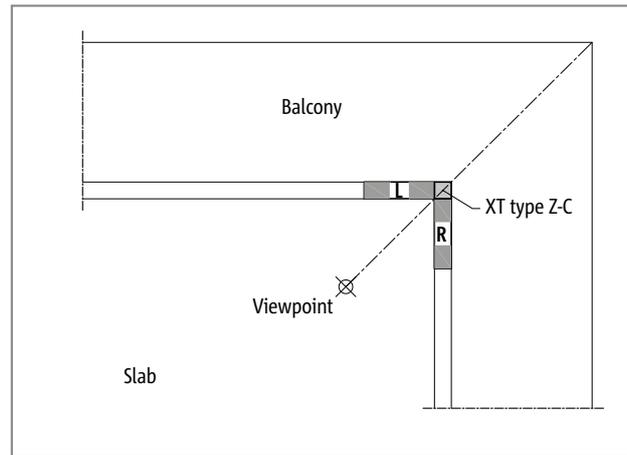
Schöck Isokorb® XT type C: Arrangement XT type C-L left from viewpoint, arrangement XT type C-R right from viewpoint
